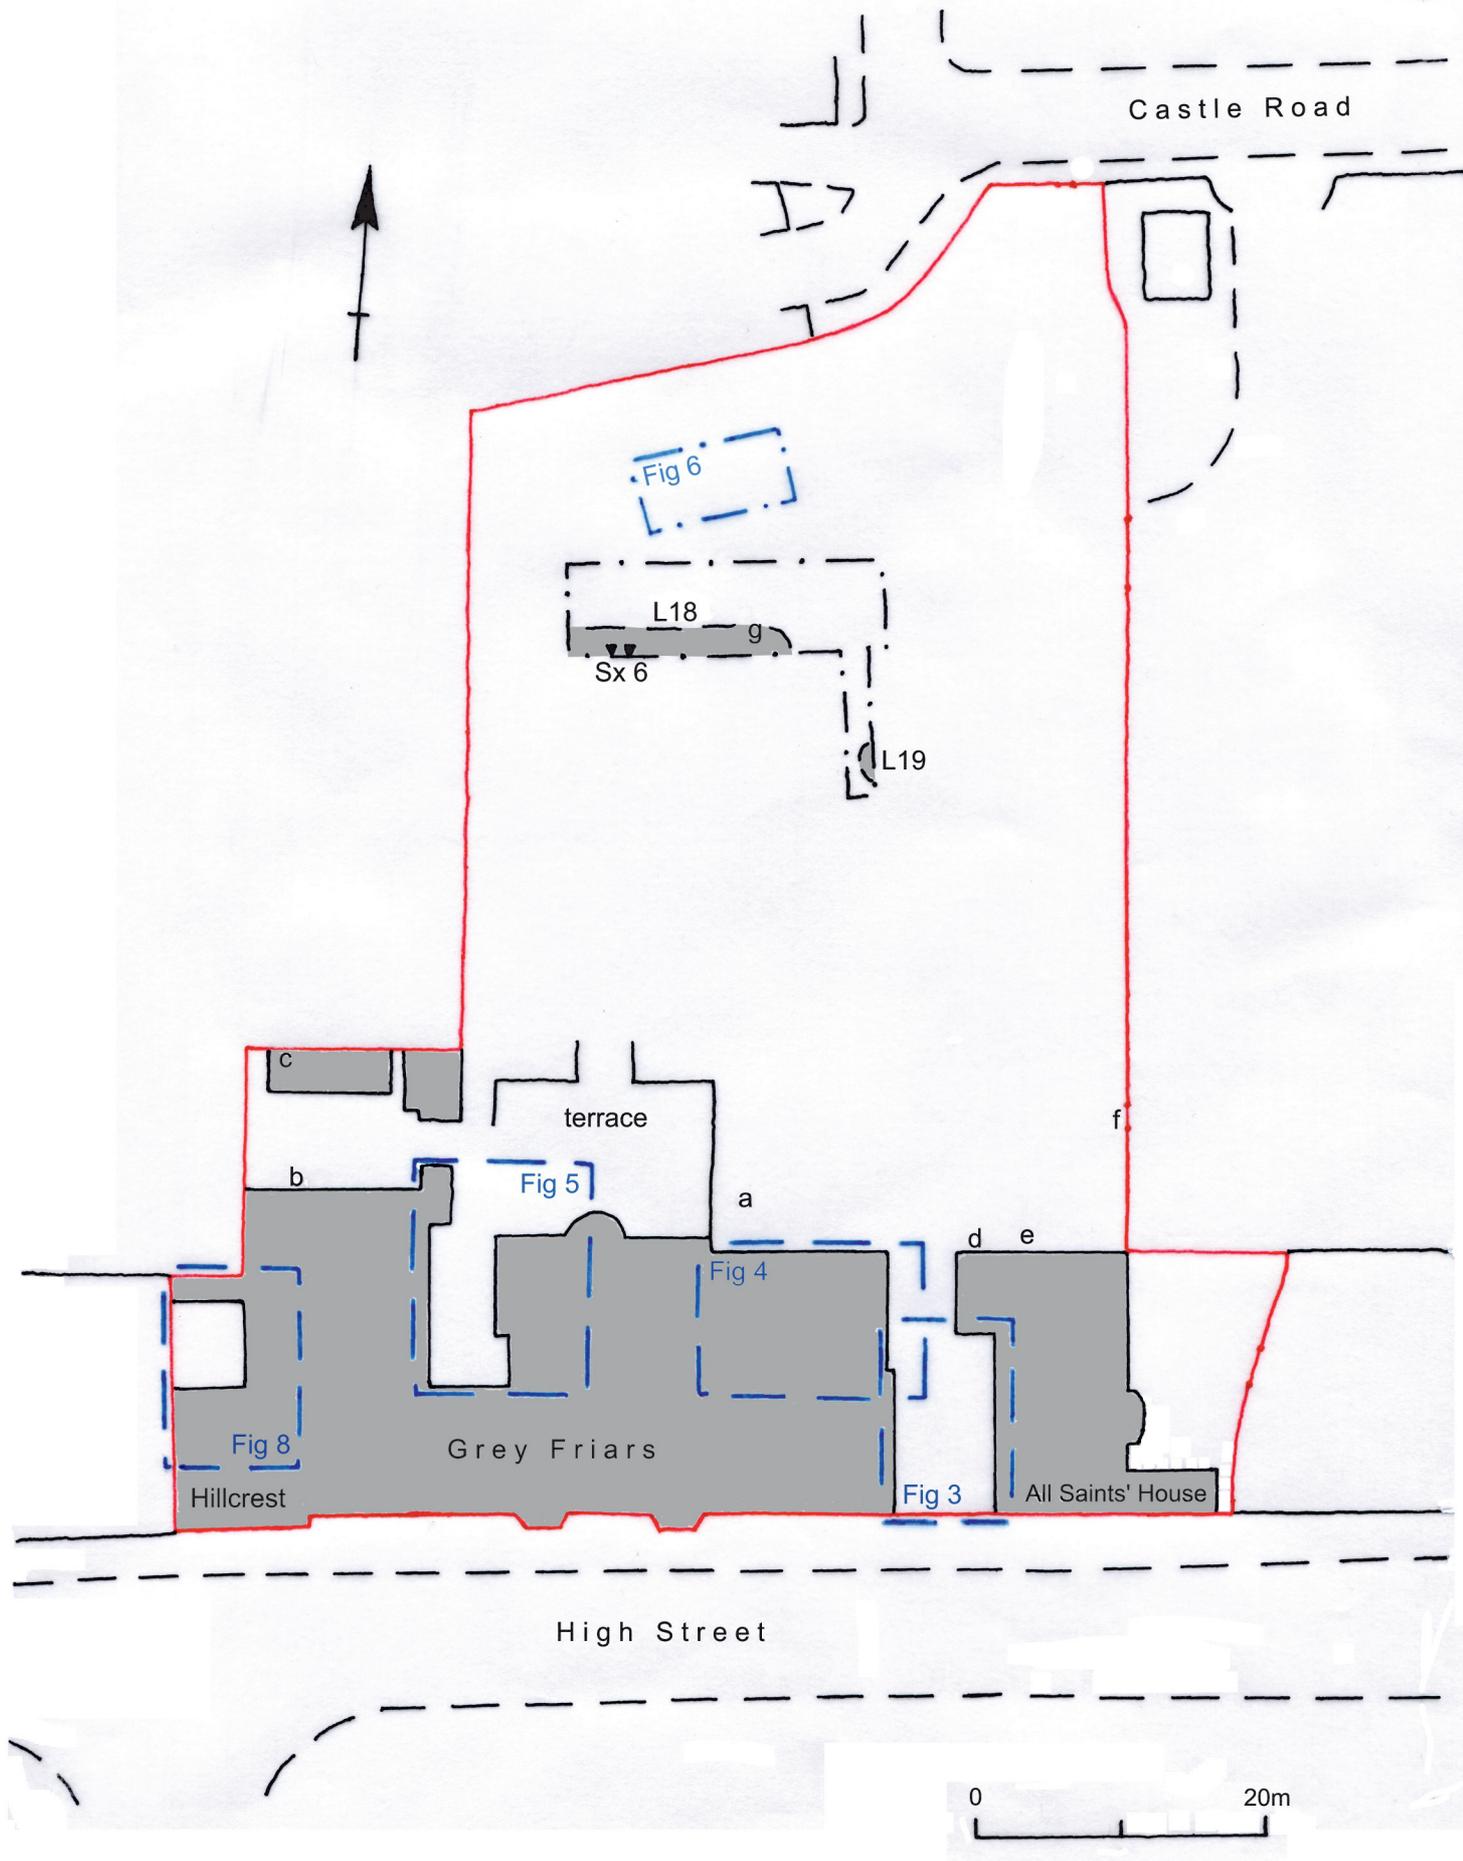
Plan of the Grey Friars Hotel site (outlined in red).
